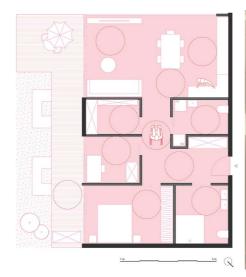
Floor plan of an apartment for a paraplegic (Zala Koščak, Maja Vučko, Ana Kovačevič, Izza Verbovšek, Lucija Petrinić, Maruša Legat, Žan Ložar (2023). Floor plan [Computer sketch]).
